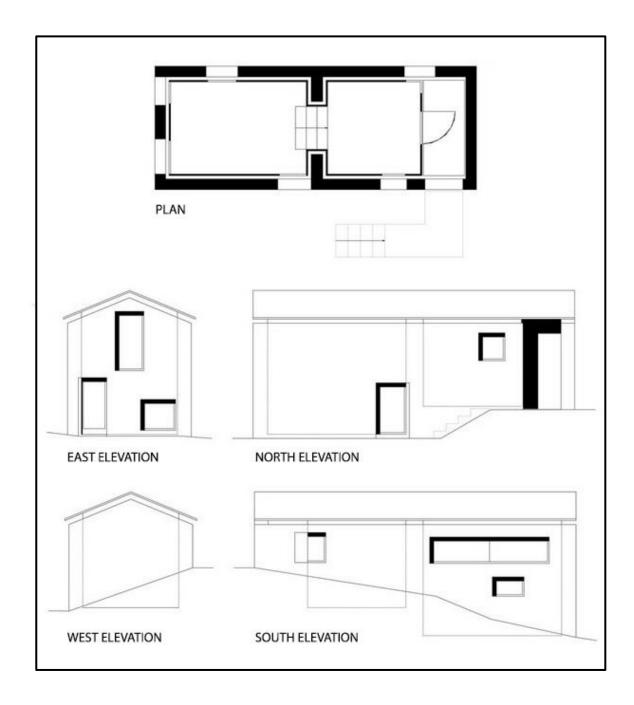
Plan and elevations of S(ch)austall, Naumann Architektur, 2005 [230]
